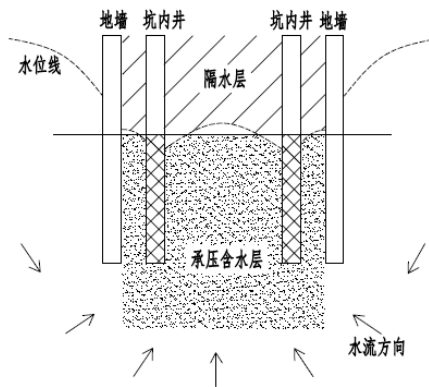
Schematic diagram of dewatering inside the hanging water-stop wall
